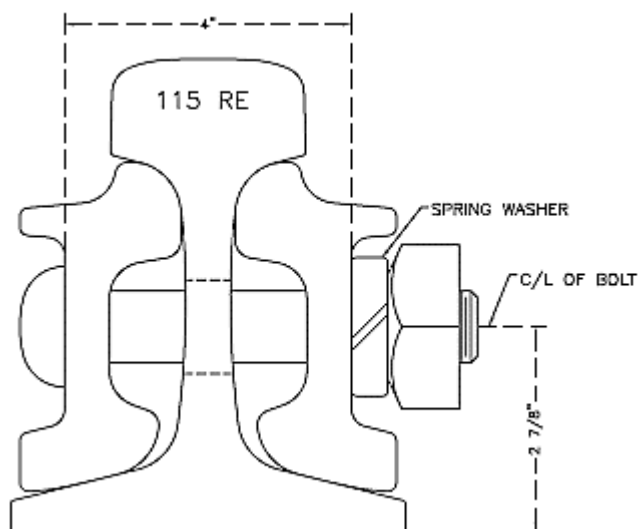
Figure SUB-PART D – 57 – Clearance Joint Bar Assembly for 115 RE
